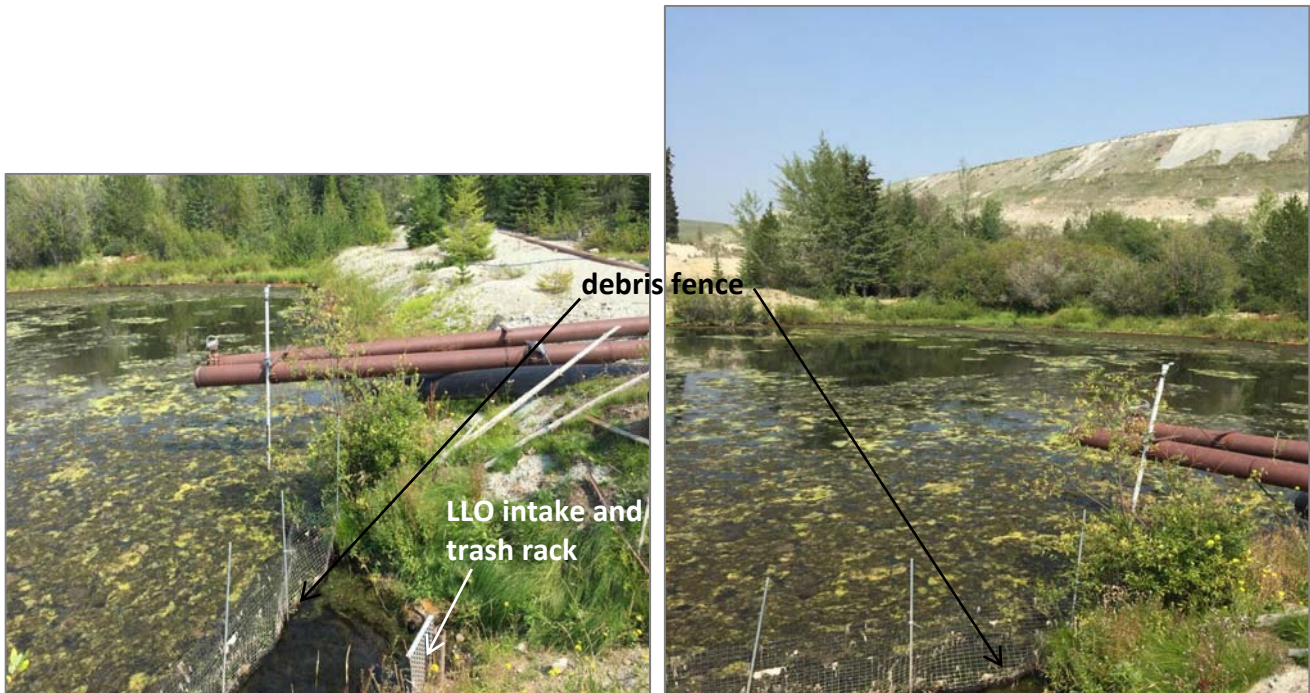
Spillway inlet, looking upstream toward pond (BTH-2018-22)
